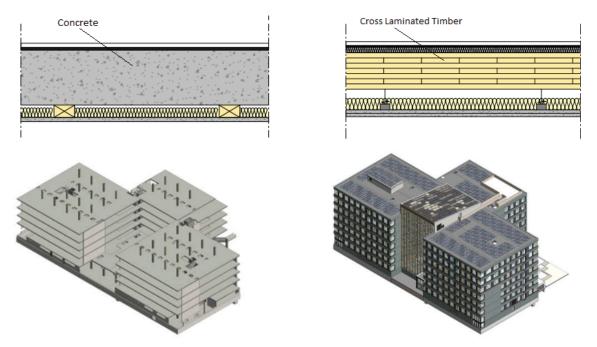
Above: Illustration of concrete and CLT floors Below: Illustrations of three retained concrete floors and the completed building with two additional cross-laminated timber (CLT) floors (scenario 1).
